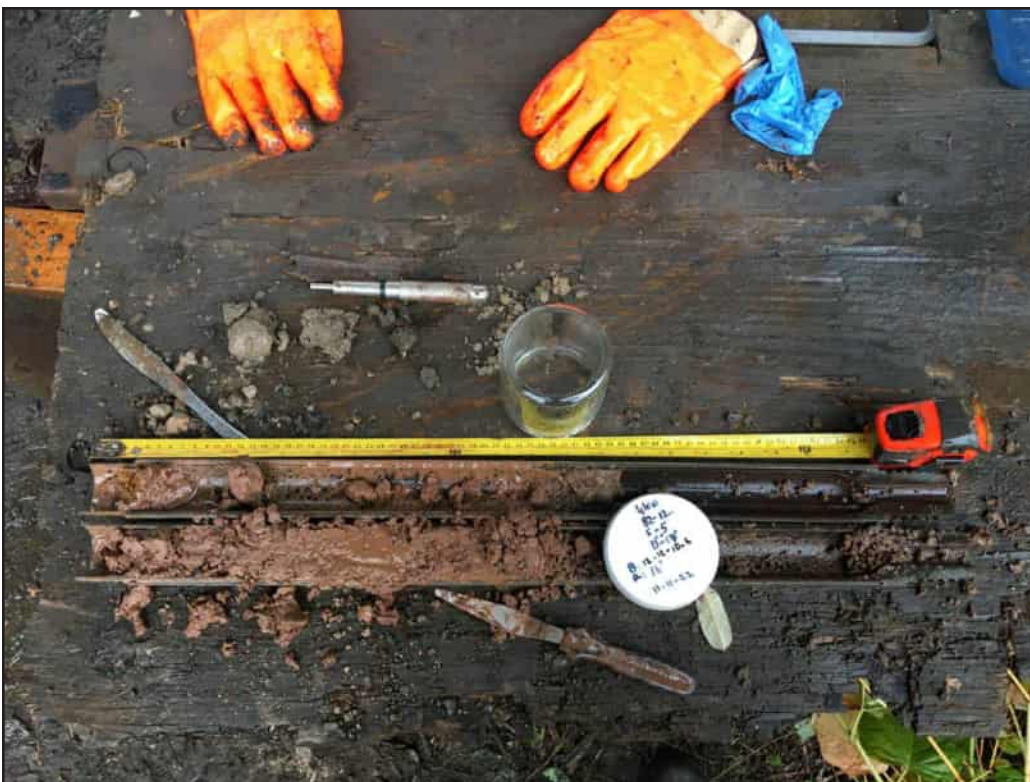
Geotechnical boring sample from Boring B2-12(OW) showing soil sample of possible subsoils at 15 to 17 feet bgs.
